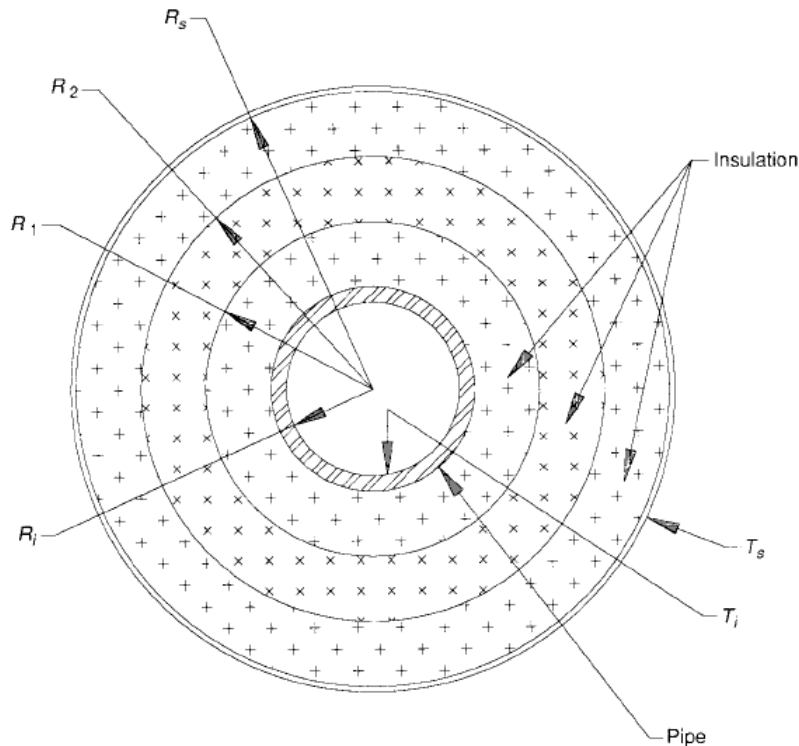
Cross-section of an insulated pipe with multiple layers.
